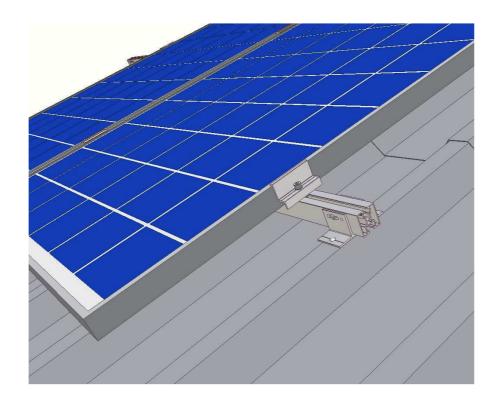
Correctly fitted hanger bolts with Duo mounting plate and aluminum L-section
